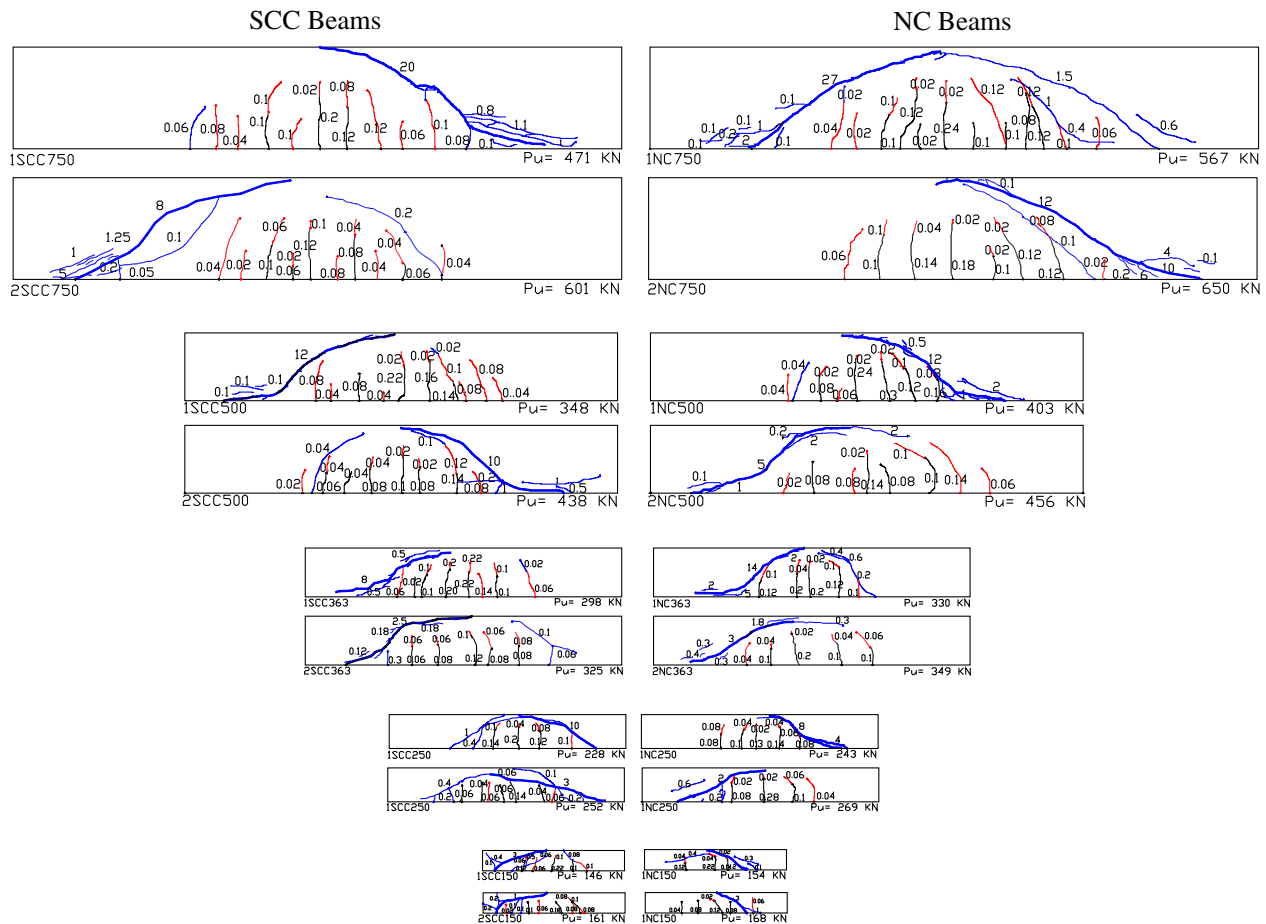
Crack patterns of SCC and NC beams at failure (crack width in mm).
